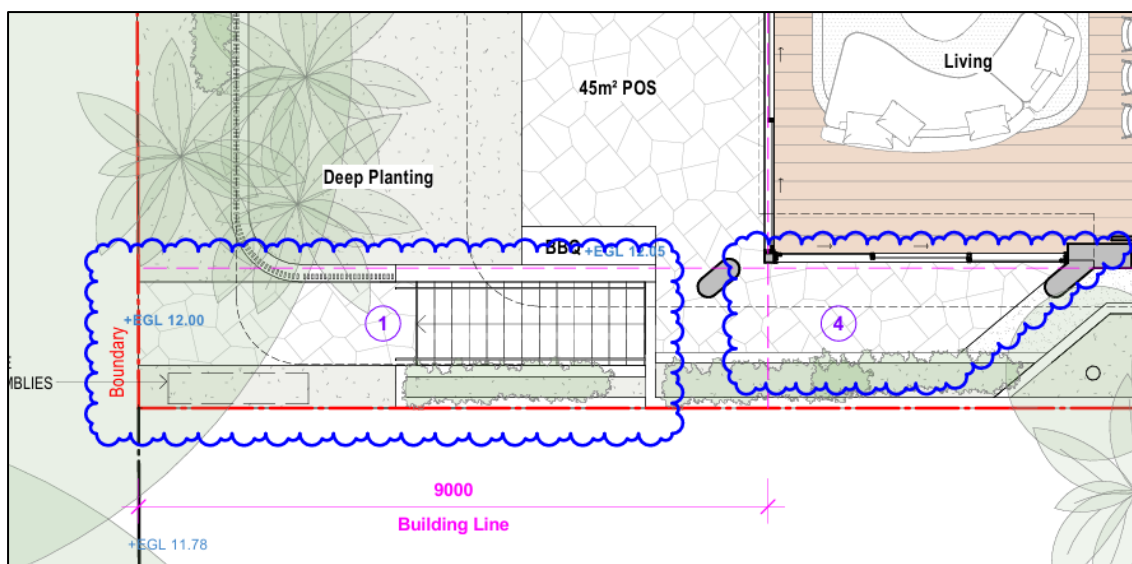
Proposed fire egress stair location – Ground Floor Extract (Source: ELK Architects)
